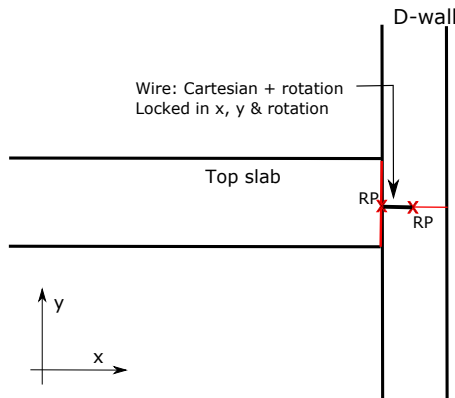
Connection between top slab and D-wall in the plane strain model
